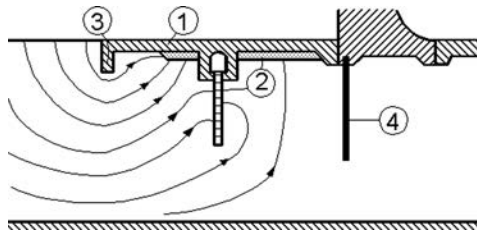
Action against chemically aggressive waters. (1) Blanket; (2) drainage; (3) cutoff wall; (4) sheet piling.
